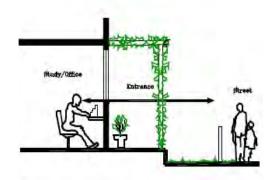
Illustration of how buildings may be designed to provide for passive surveillance to and from a public place.
